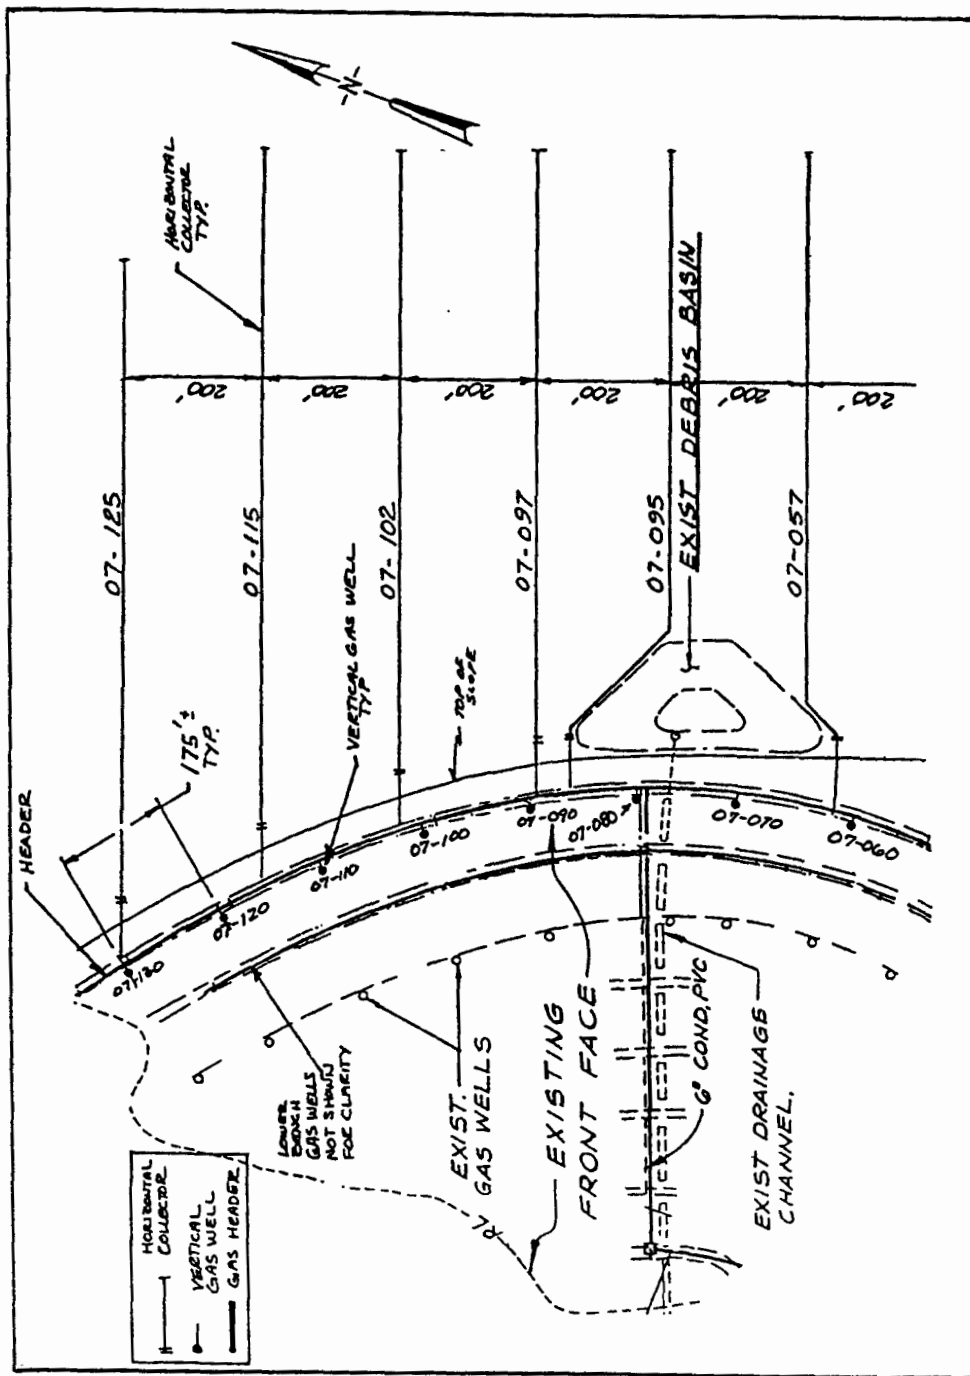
Scholl Canyon Landfill - Front Face Horizontal Collectors and Vertical Gas Wells
